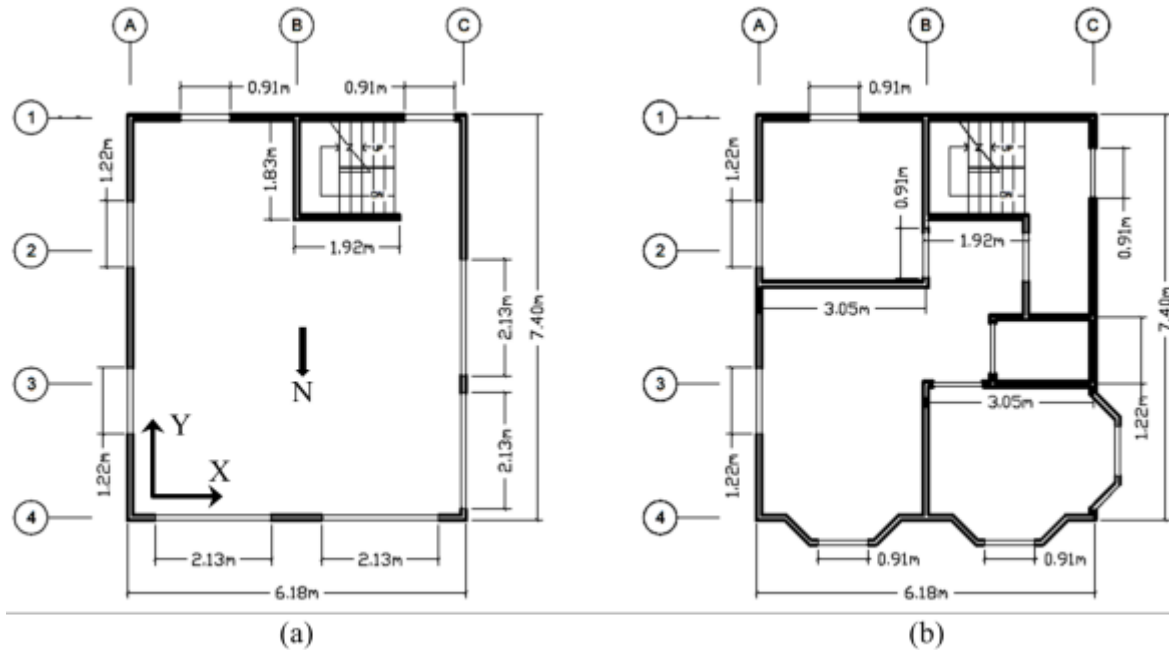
Floor Plan of Un-retrofitted Test Building:
